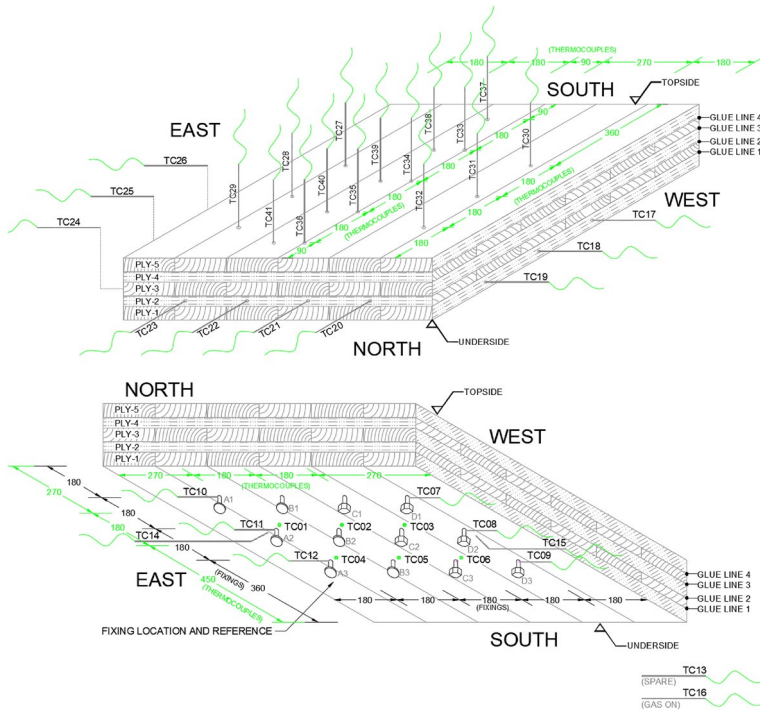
Locations of thermocouples, Top: Internal locations. Bottom: Exposed/below the CLT panel. The depth of the thermocouples is detailed in Table 3
